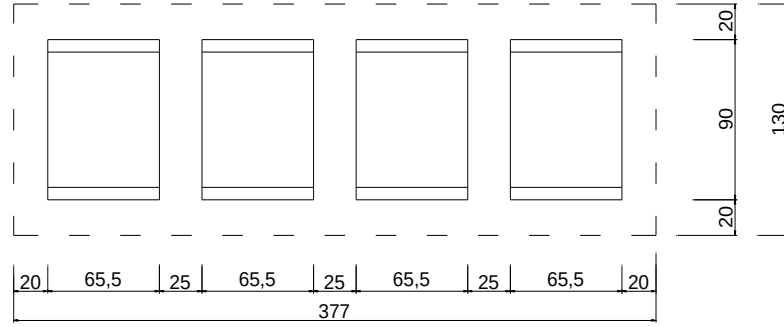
Layout plan of medium-size specimens placed at exterior conditions.
